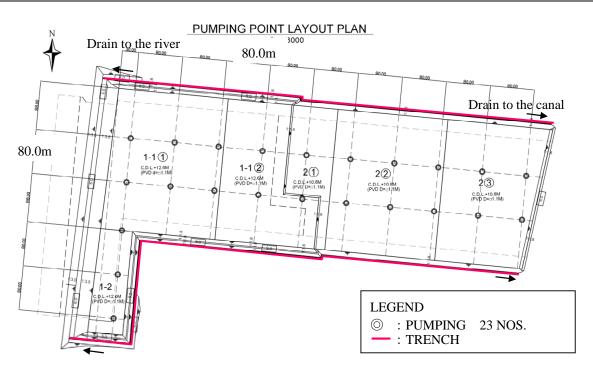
Plan map for Pumping Well and Drain Trench
